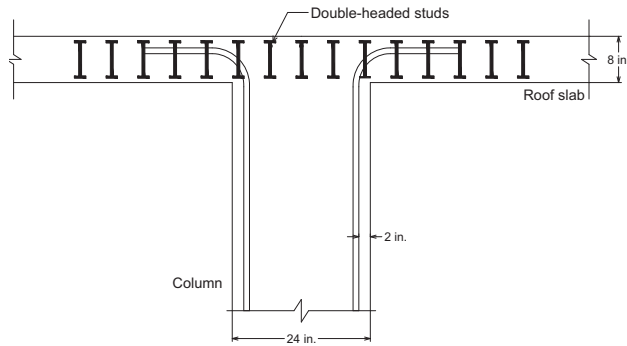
An example of use of double-headed studs to improve joint ductility (scaled)
